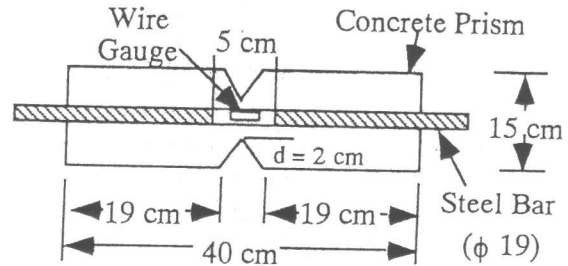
Layout of the Specimen for Tension Test of Axially Reinforced Specimen
